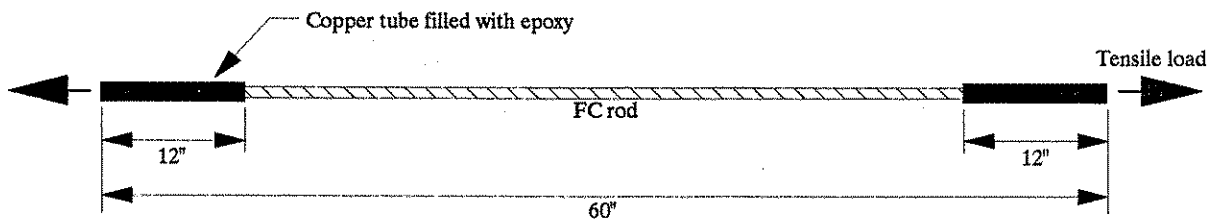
Dimensions and details of FC rod specimen used in tensile testing
